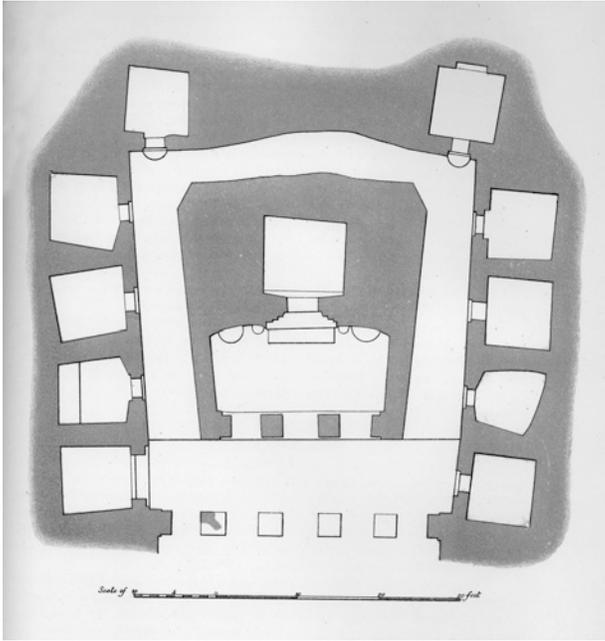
Aurangabad cave no. 6, plan (Burgess 1878).
